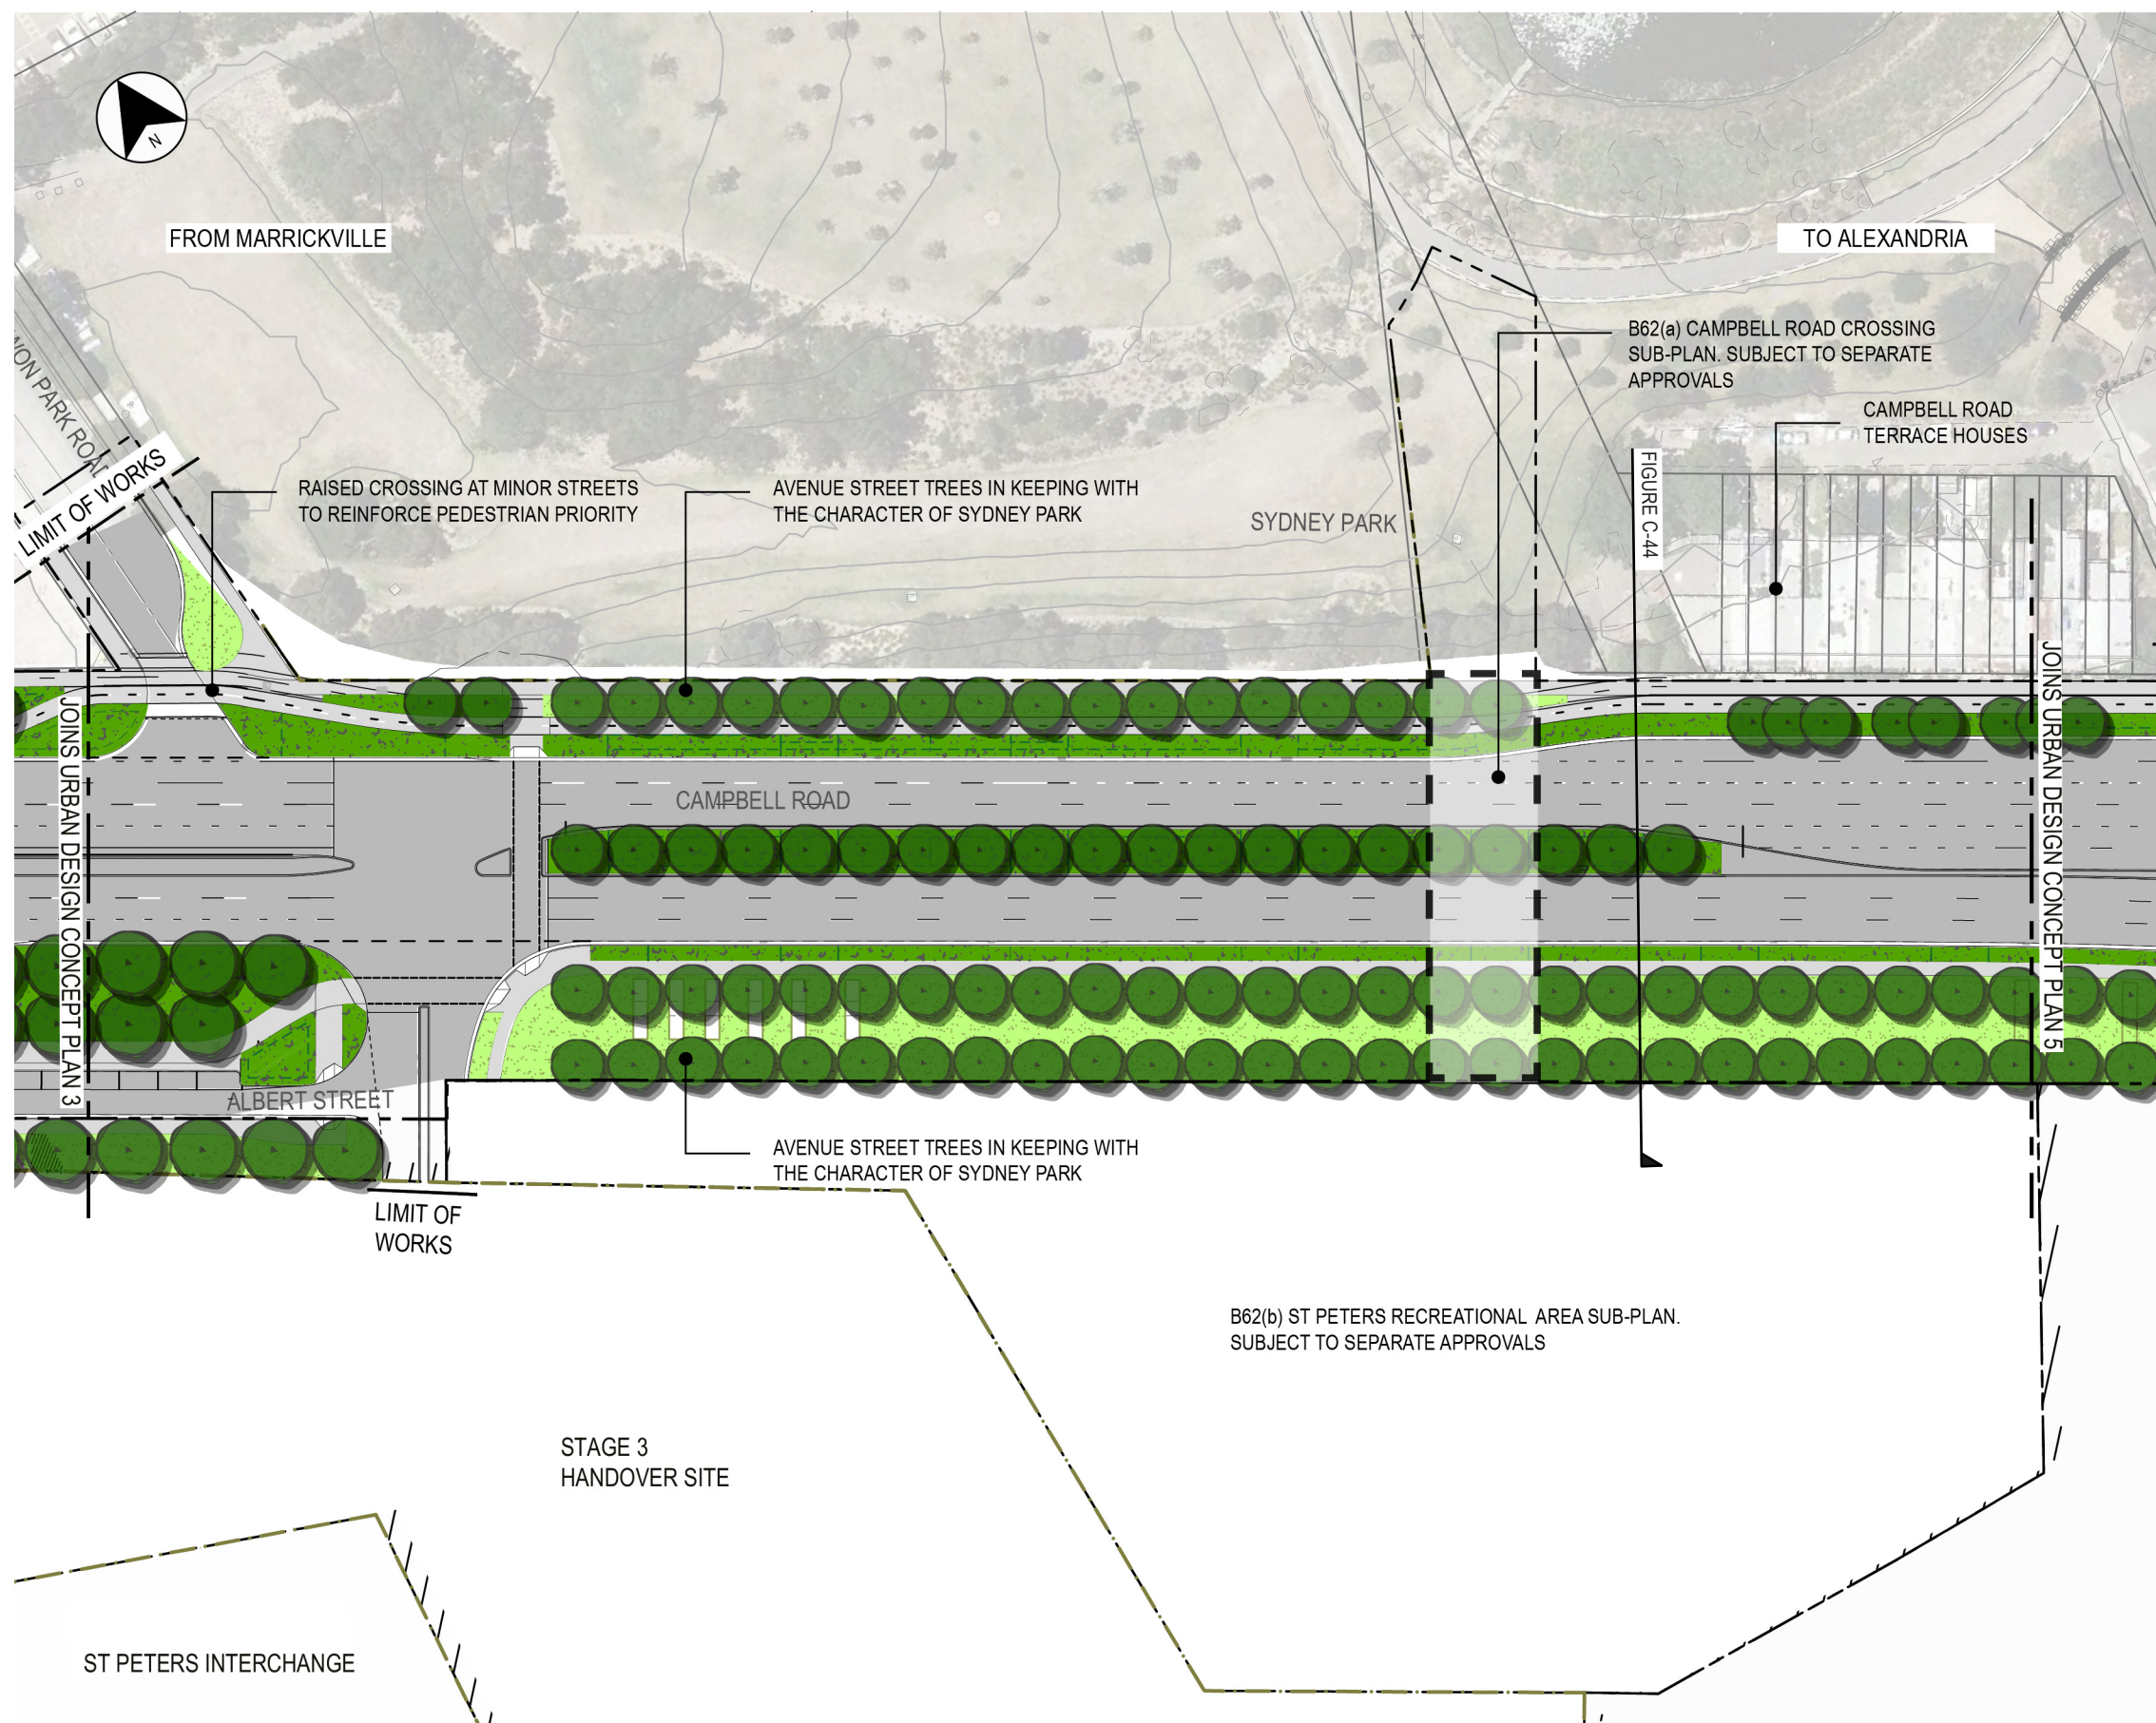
Campbell Street Green Link - Urban Design Concept Plan - Campbell Street / Campbell Road - Sheet 2 of 6 - 1:1000
